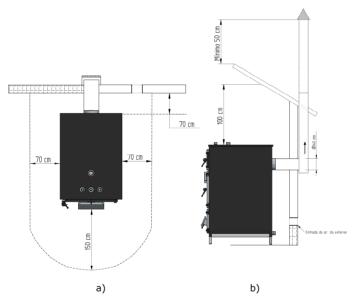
Minimum distances to all surfaces: a) top view of the installation of equipment; b) side view of the installation device
